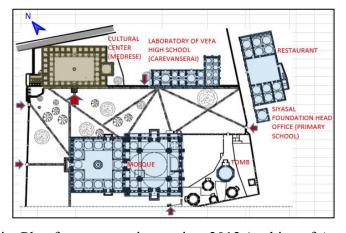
Site Plan from restoration project 2012 (archive of Anıt Architecture)
